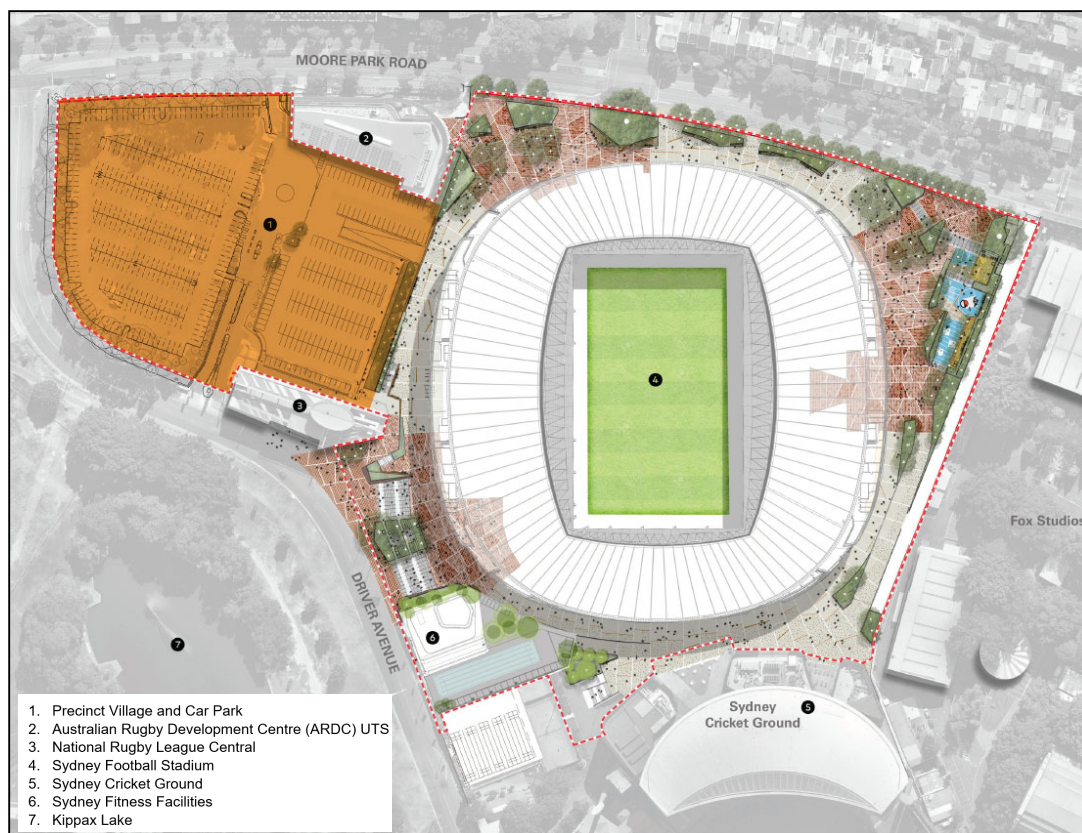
Precinct Village and Car Park Location (highlighted orange)
